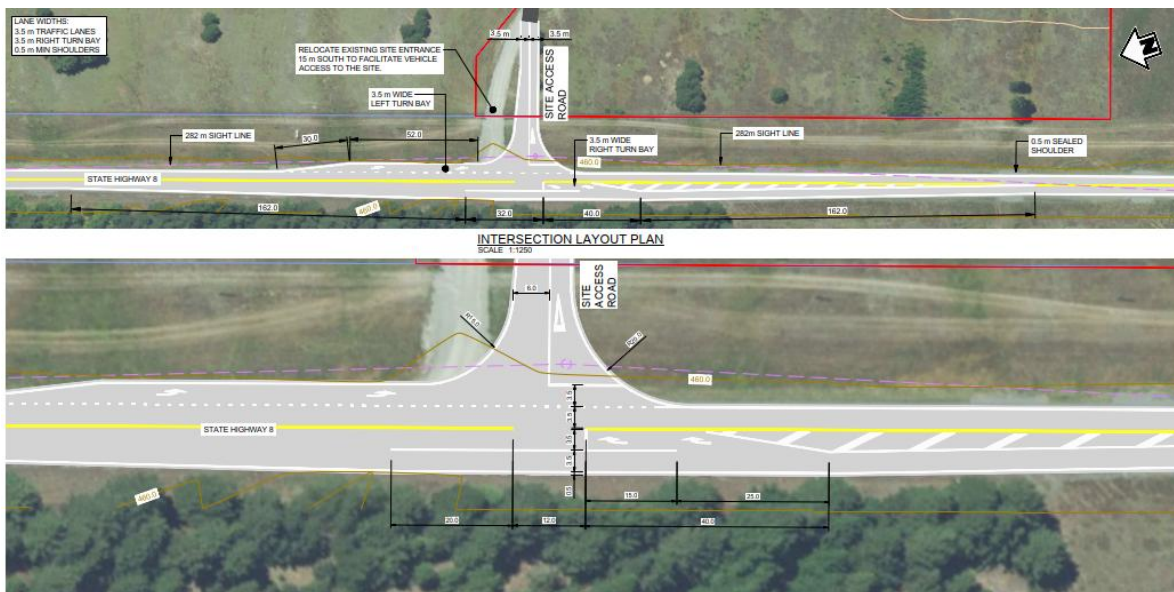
Proposed site access and SH 8 upgrade (source: BTW, 2024)
